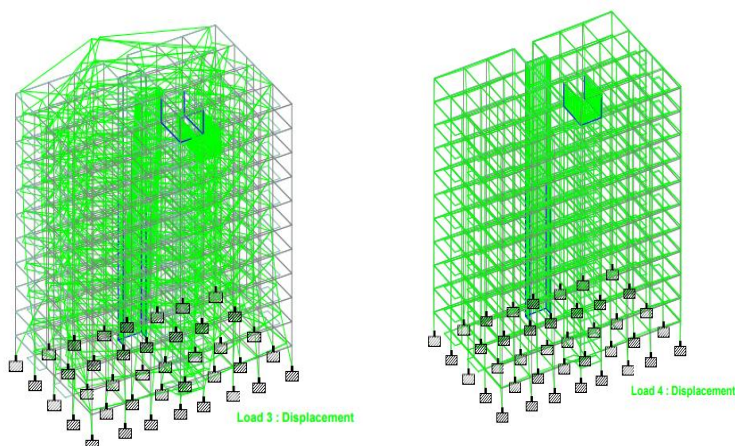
Deflection due to wind load acting on structure (X and Z) Directions
